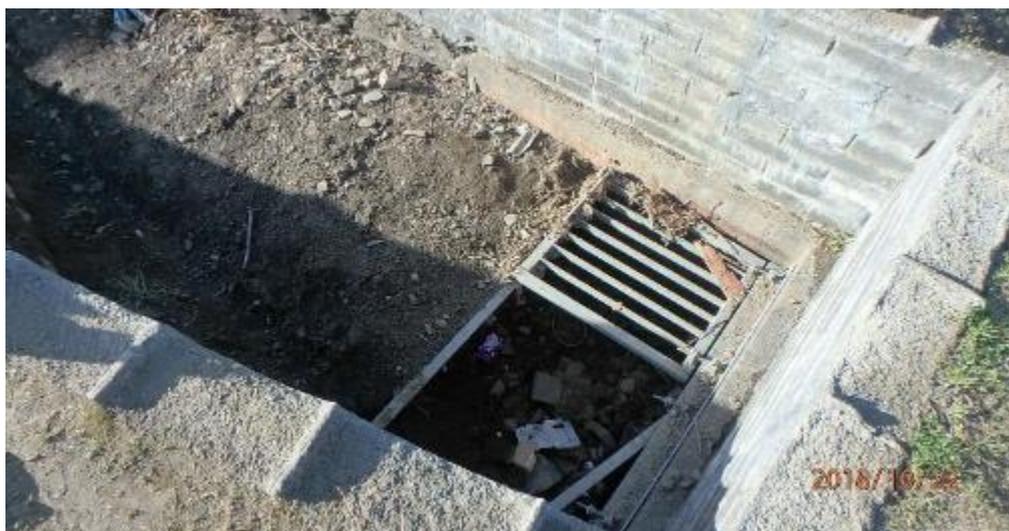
Post Event Flood Inspection: This photo depicts the accumulated debris and defective trash screen of Culvert 2 following Storm Callum.
